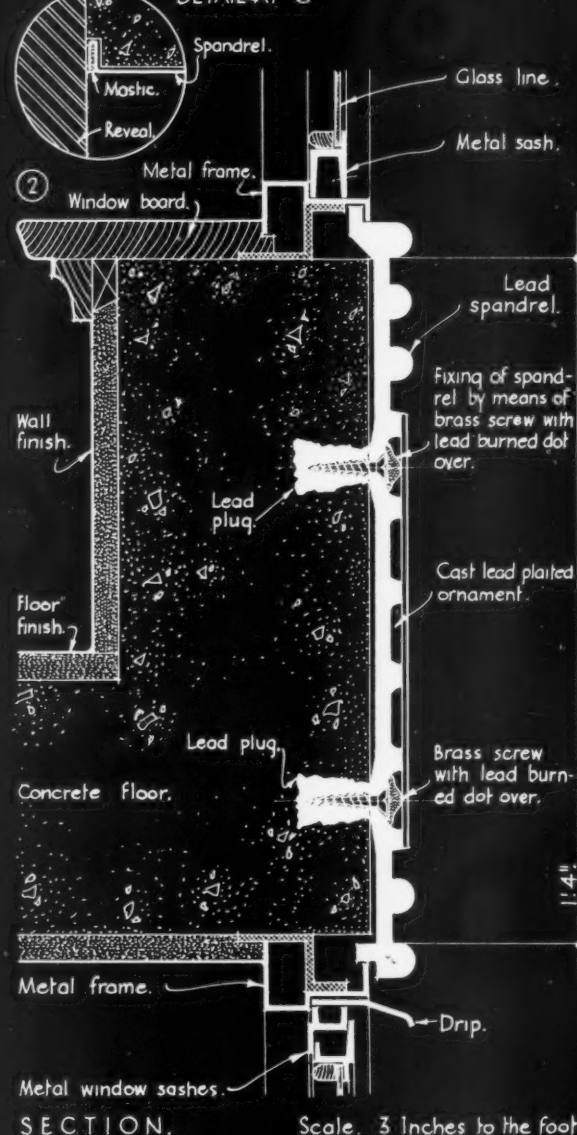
DETAILS OF LEADWORK IN A FLAT SPANDREL BETWEEN WINDOWS.
